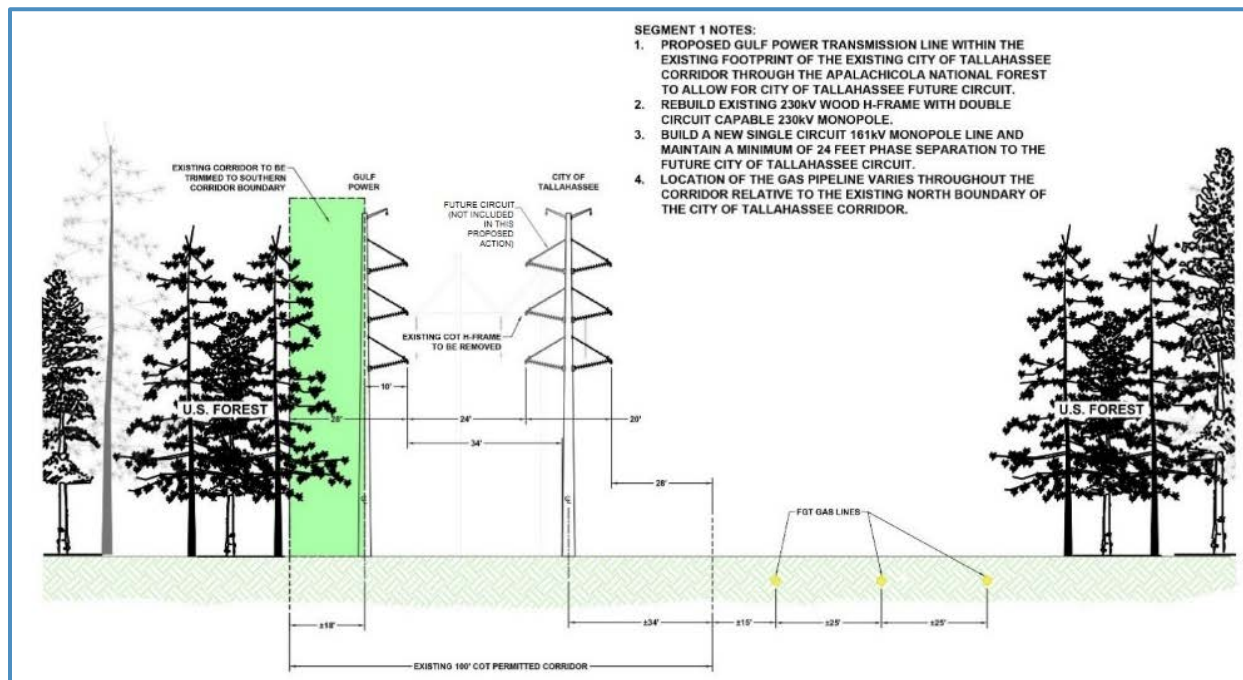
Segment 1 Corridor Cross Section Looking Northwest
